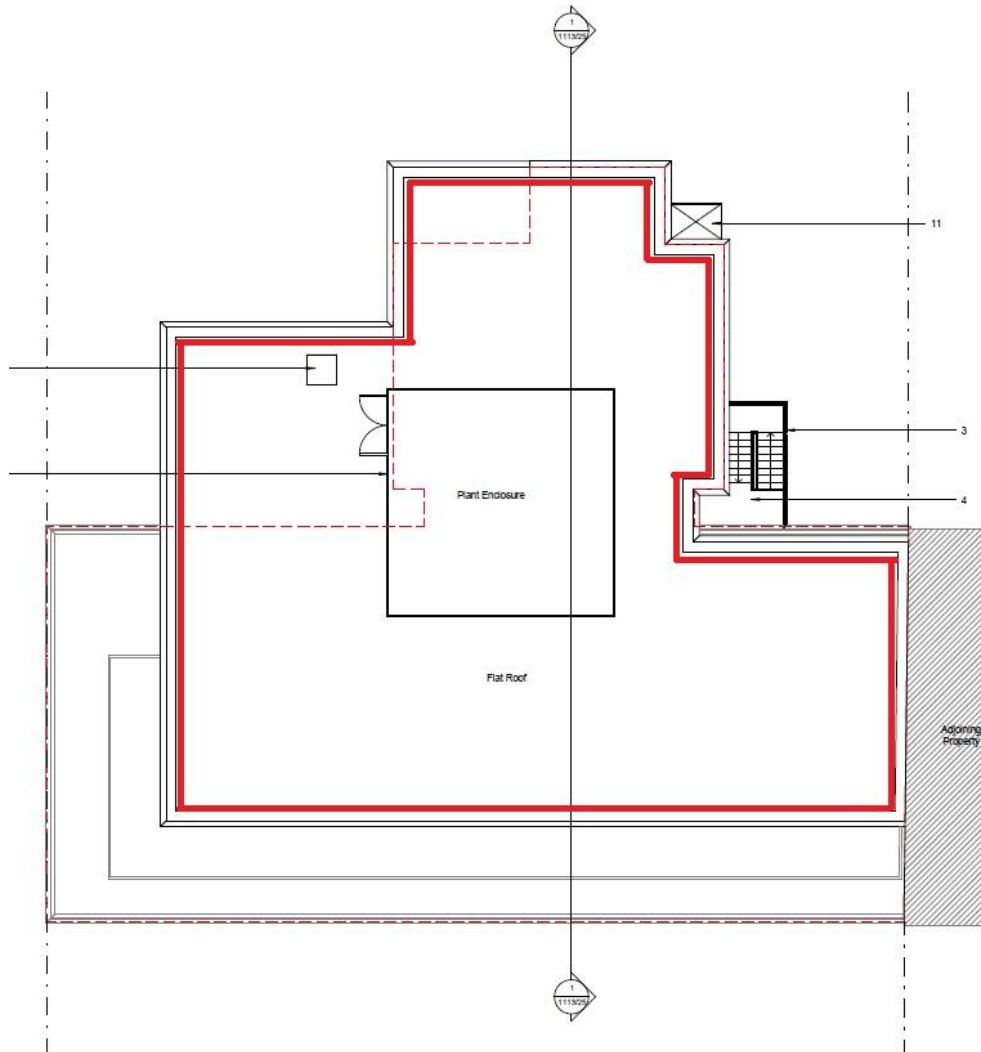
Proposed new flat roof with highlighted potential area for PV installation
